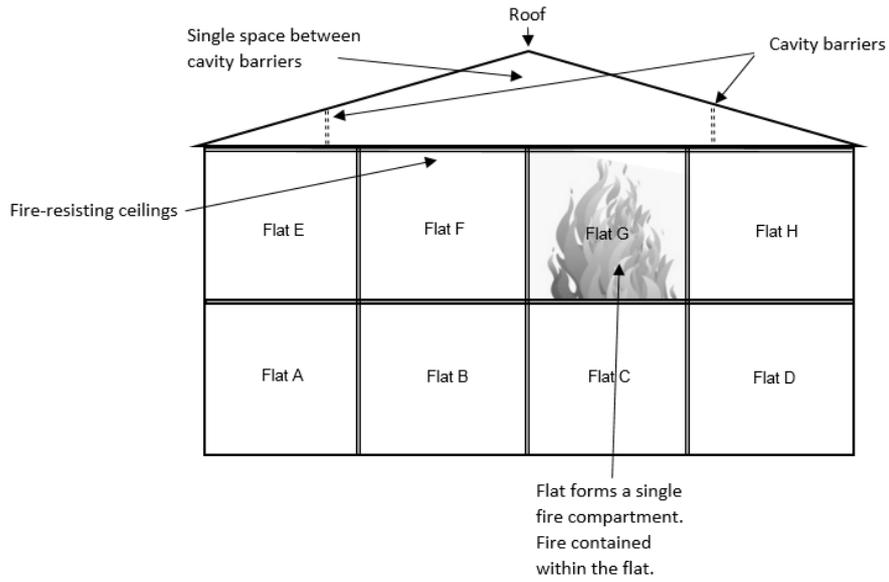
Fire Resisting Ceiling and Cavity Barriers in Roof Void
